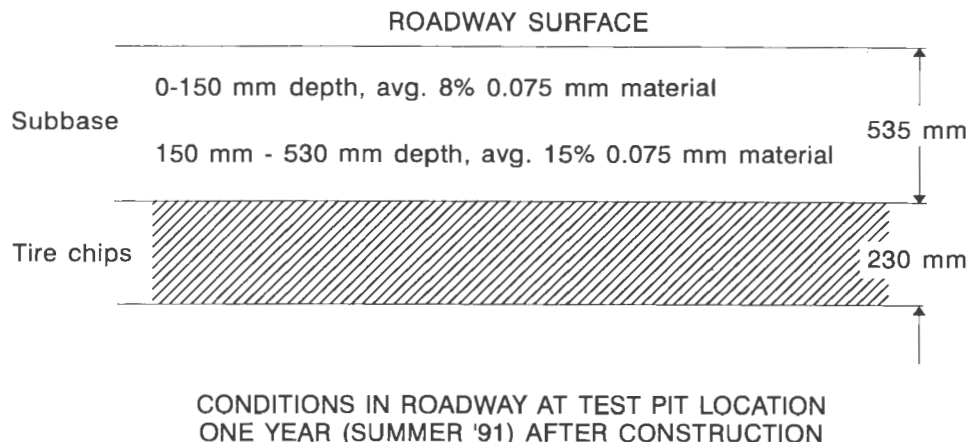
Conditions on roadway at test pit location one year after construction (summer 1991).
